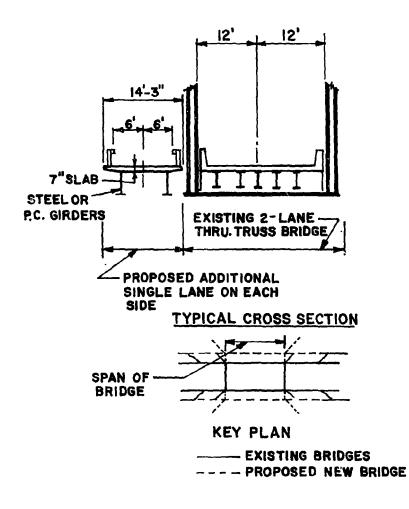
ADDITIONAL LANE FOR HEAVY TRAFFIC
